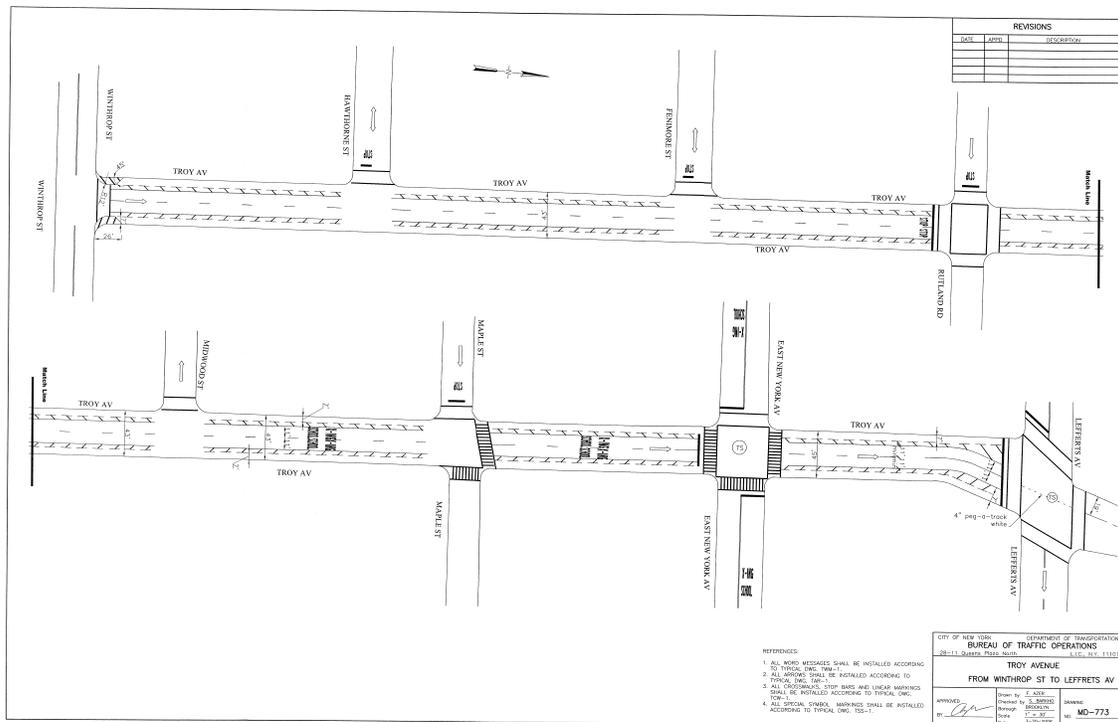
A: Bureau of Traffic Pavement Marking Plan for Troy Avenue (MD-773)
